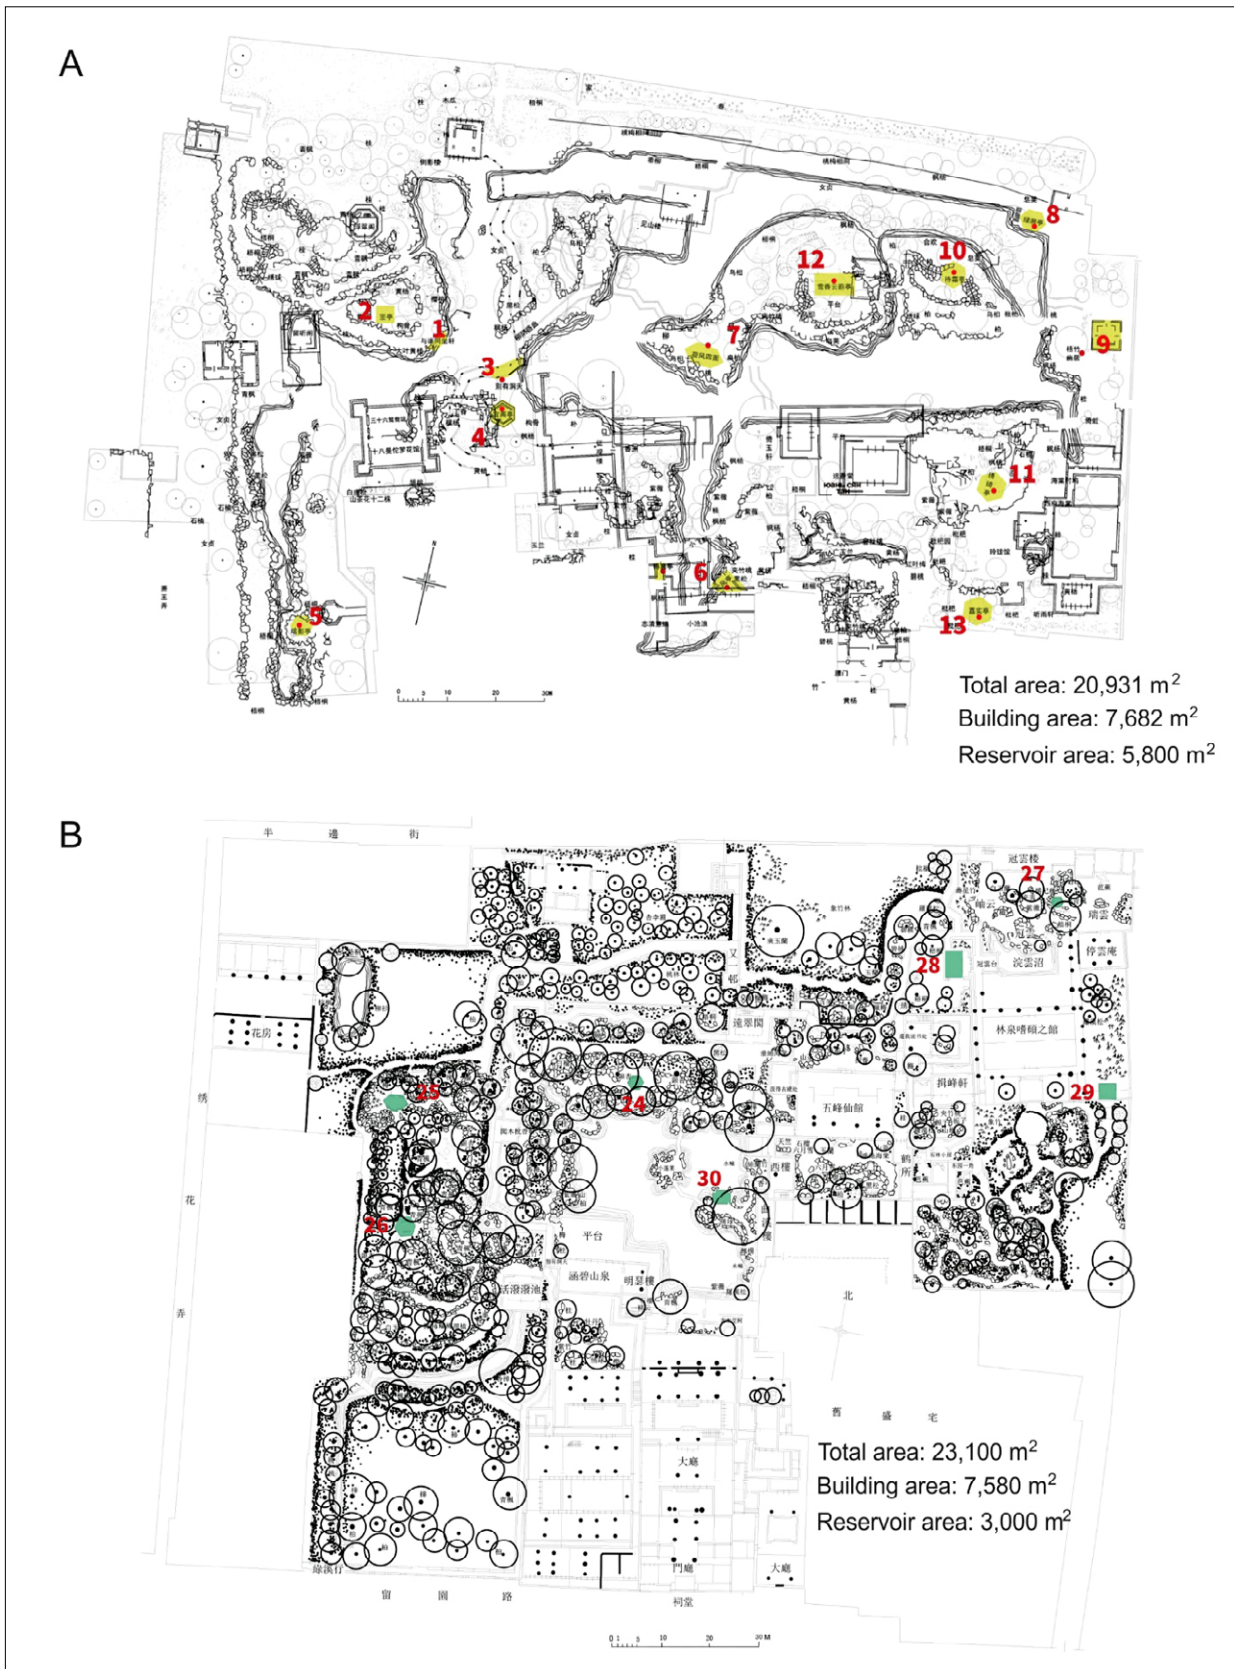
Examples of the most famous Suzhou private gardens: A—plan of the Zhuōzhèng Yuán Garden, B—plan of the Liú Yuán Garden.
